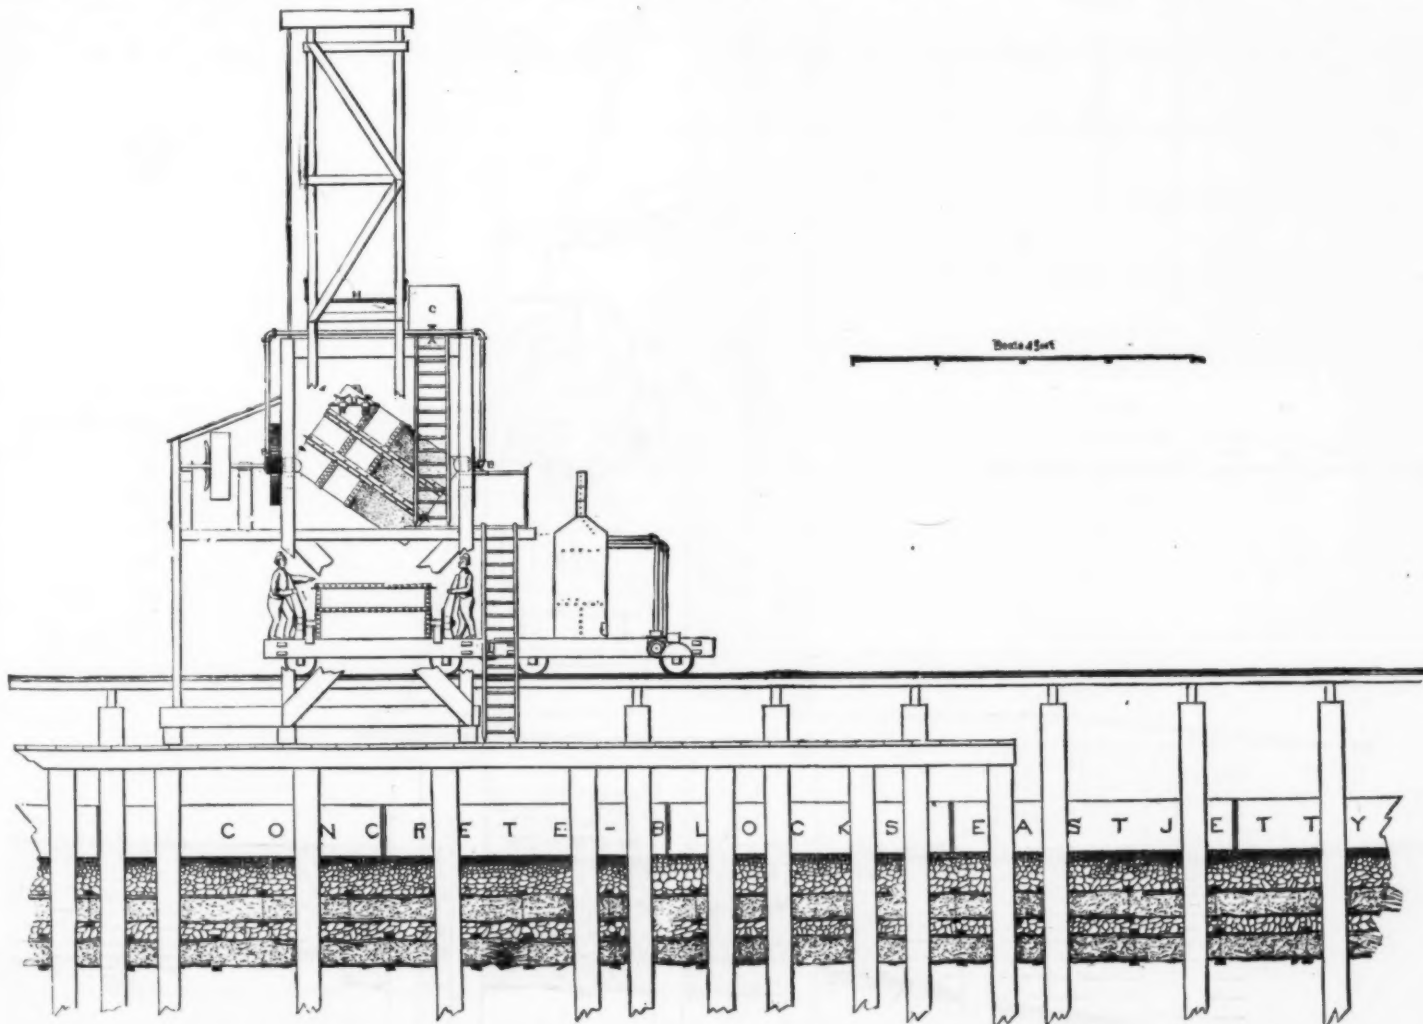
PLATE VI.—CONCRETE MIXER ON EAST JETTY, 10,200 FT. BELOW EASTPOINT.—SIDE ELEVATION
